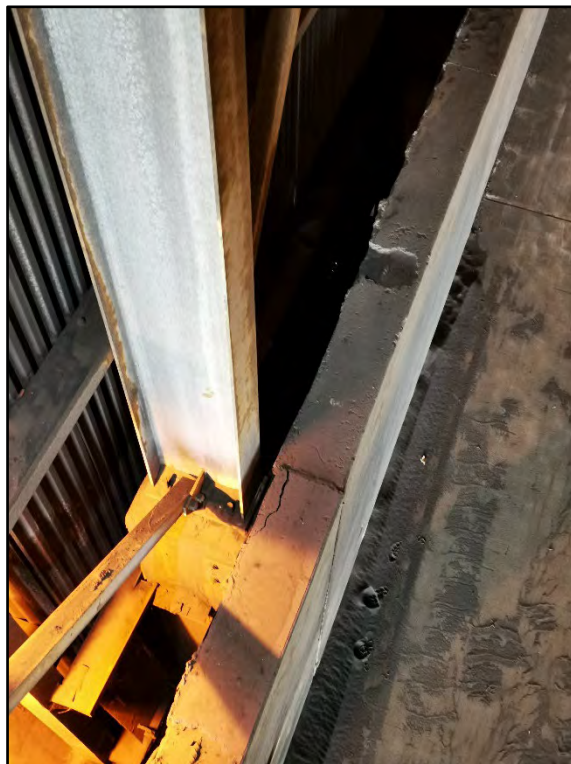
Surface Corrosion of Purlins, Girts, and Sheeting
